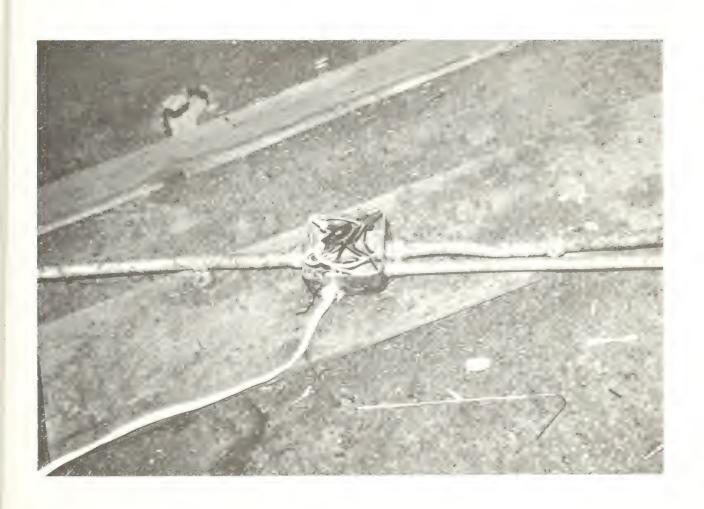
Market Attic Detail (5/86). Close-up view of junction box and wiring, both in and out of conduit, as installed in the attic in 1975.
